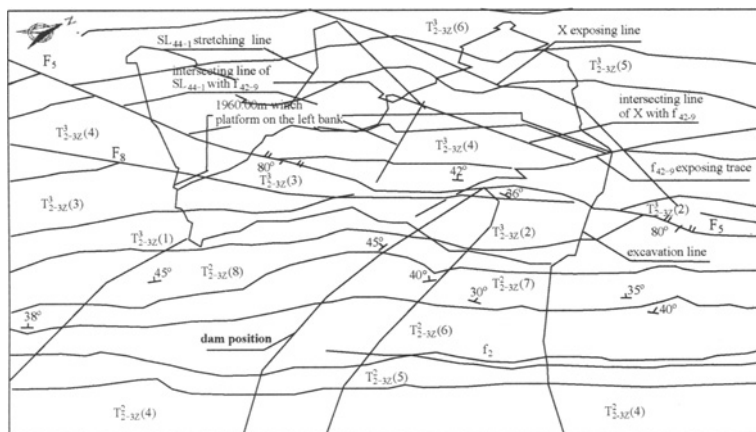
Engineering geology plan of left abutment and spandrel groove (modified after Zhou Zhong et al., 2006)
